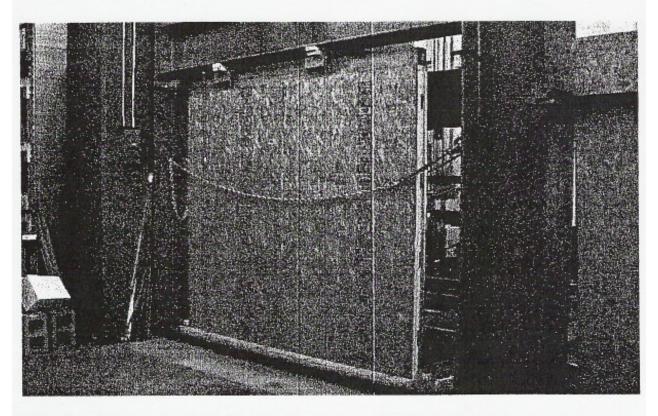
Test Setup for Racking Loading on 8' OSB-OSB Panel
